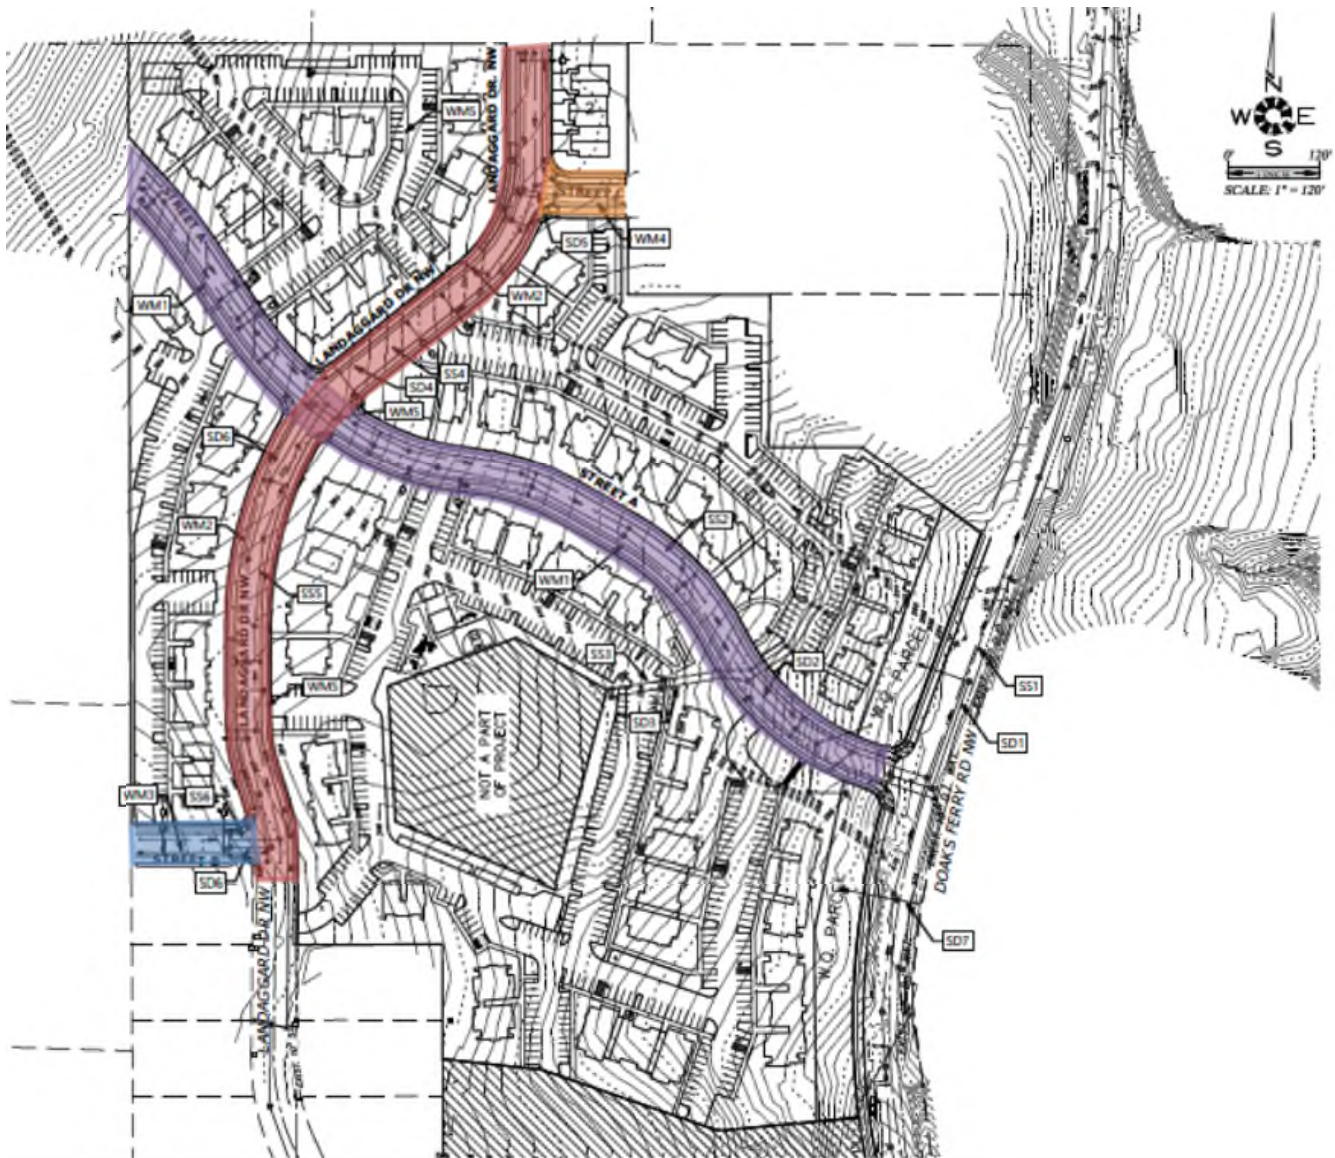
Overall site plan. The streets highlighted show the connecting streets required by City of Salem design standards.
